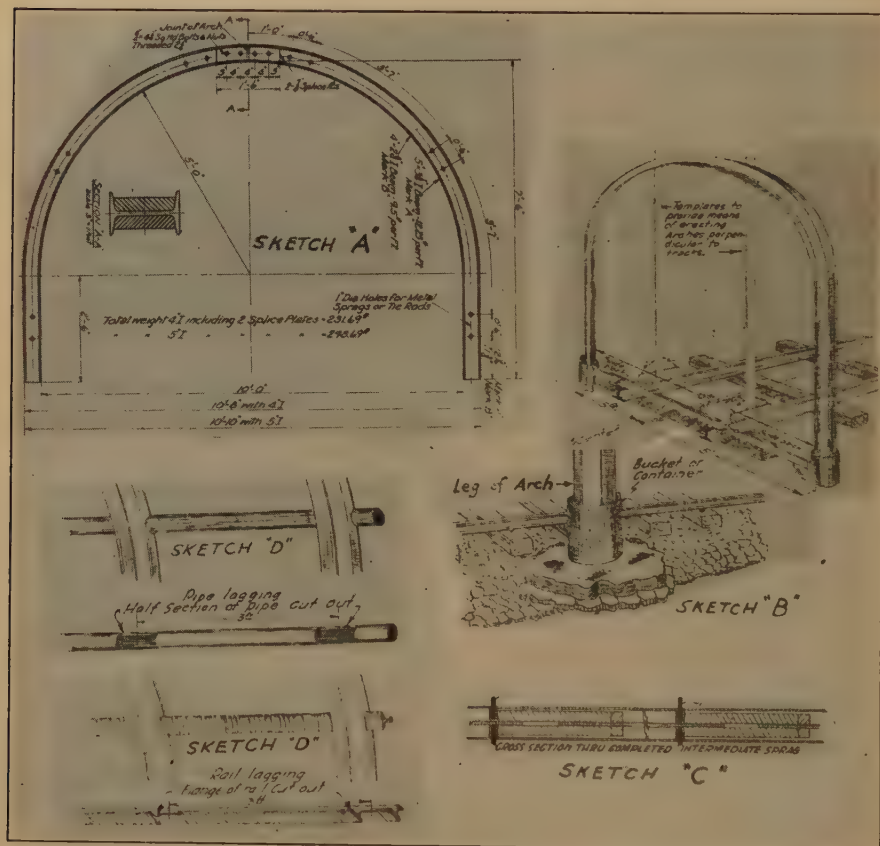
DETAILS AND CONSTRUCTION OF STEEL ARCHES.
